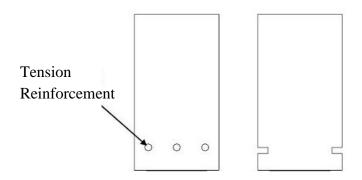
Reduced concrete width (Pham and Al-Mahaidhi, 2005)
